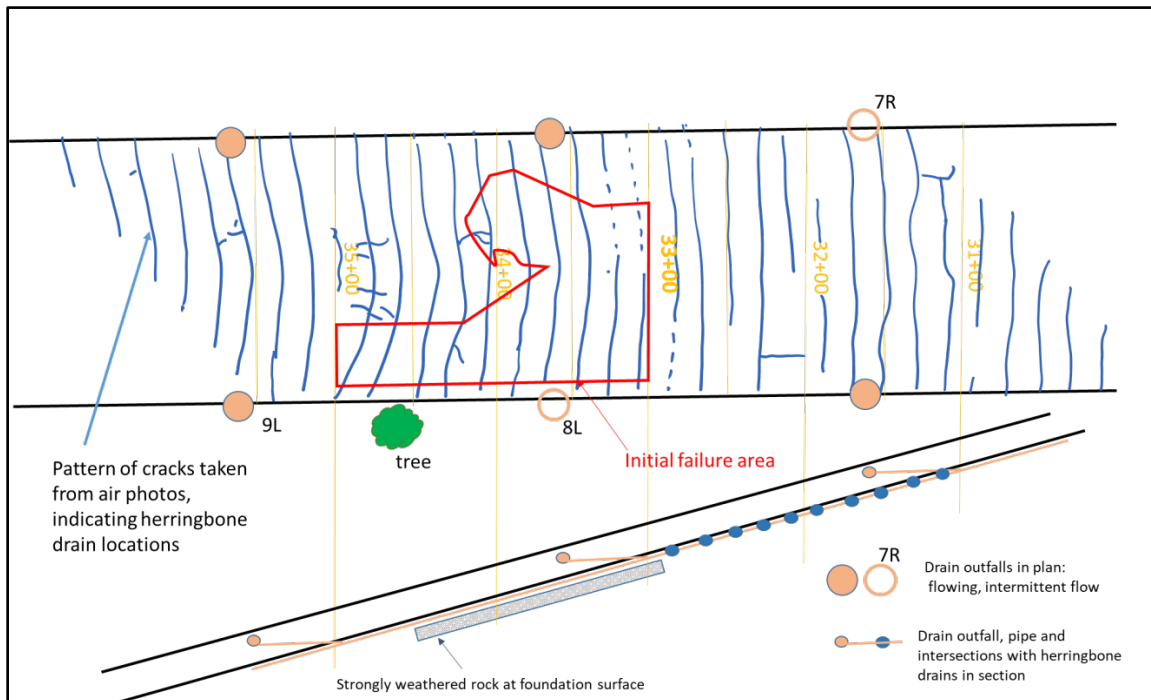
Drain outfalls and herringbone drains in the vicinity of the initial chute failure
